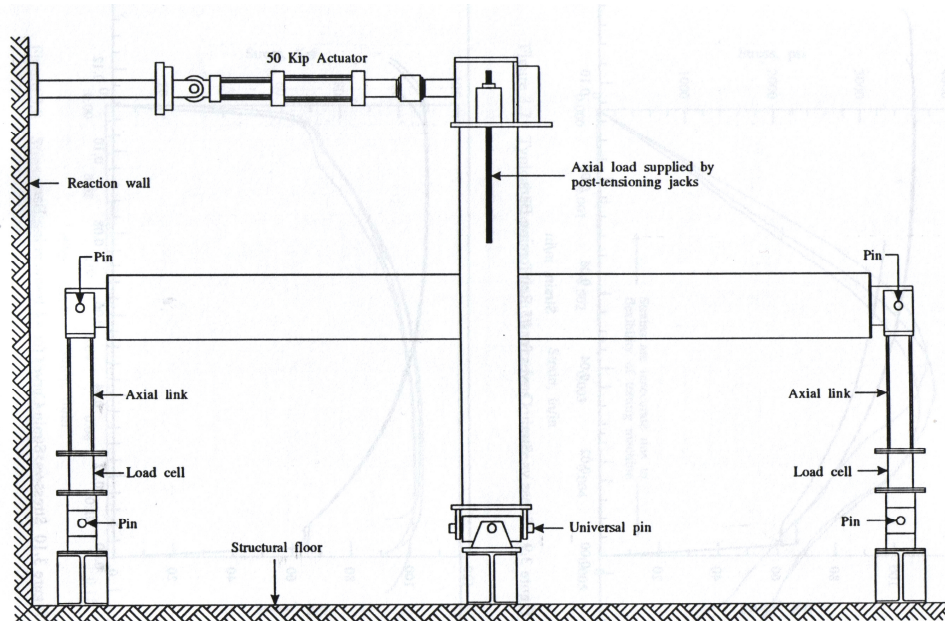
Test Setup - Specimens of Raffaele and Wight
